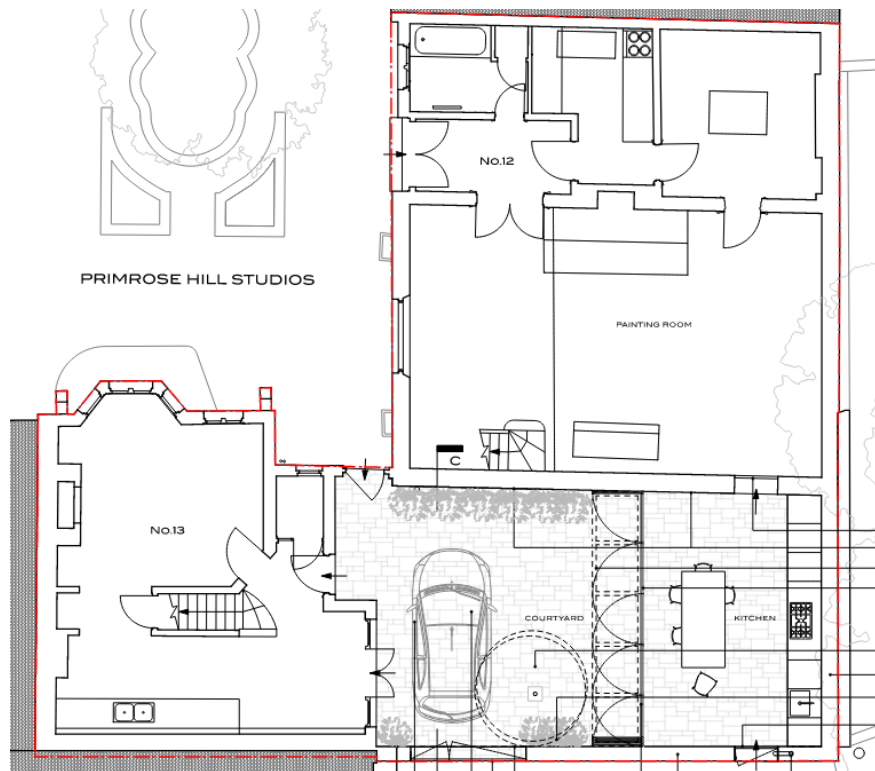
Proposed ground floor as applied for under this application (ref. 2024/3836/P).
